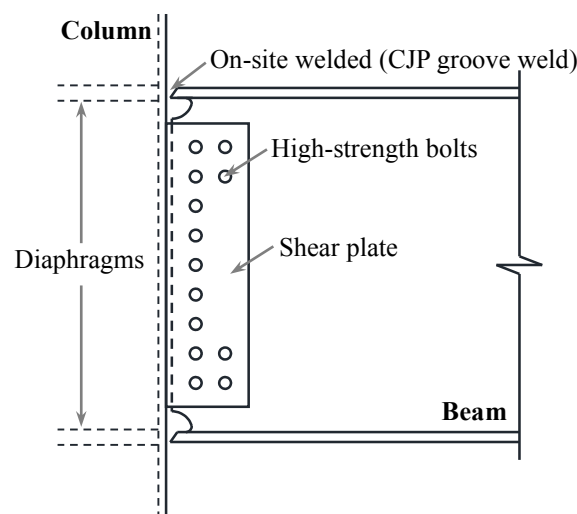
Welded Flange-Bolted Web Connection (WFBW)
